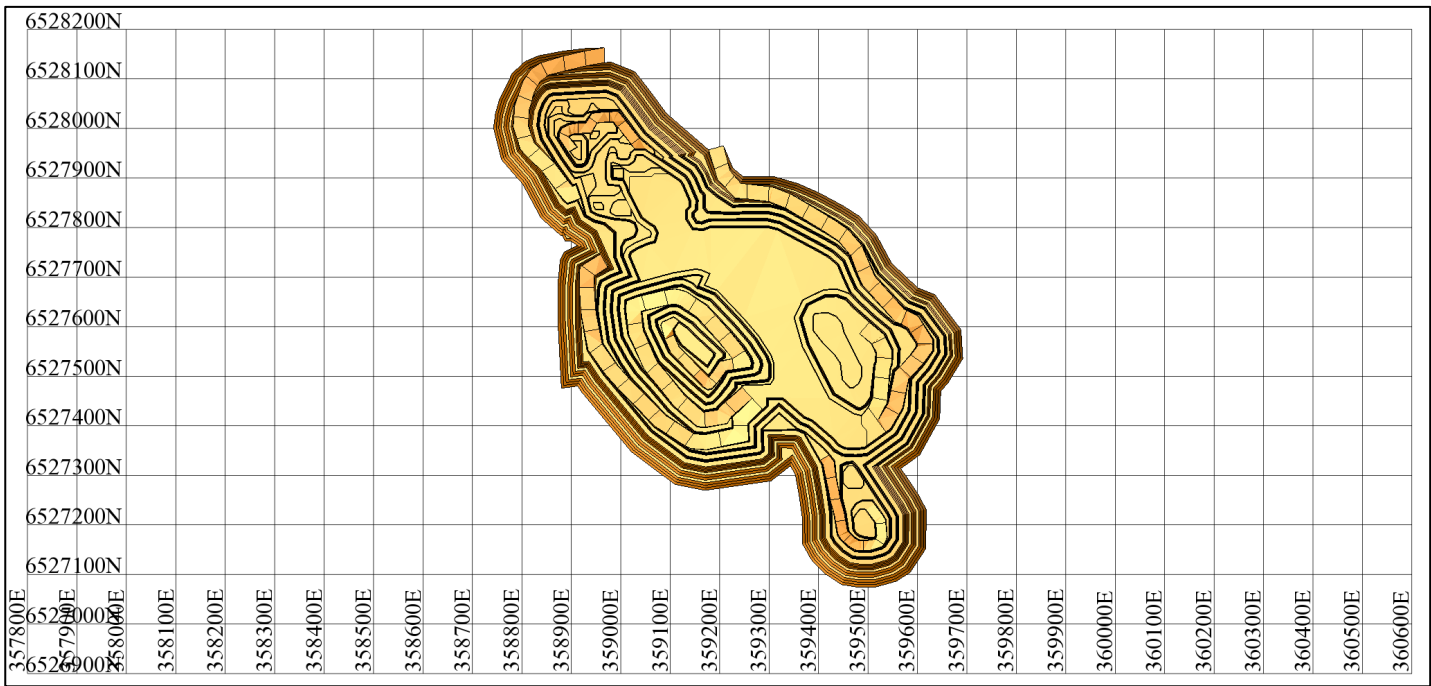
Theia stage 4 pit design – Plan view - Production Case
